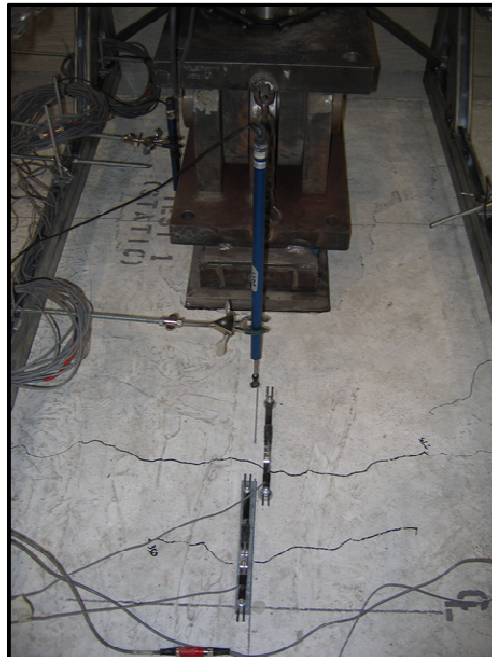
(b): Photograph showing pi gauge locations on the top concrete surface over the girder (typical all test locations)
